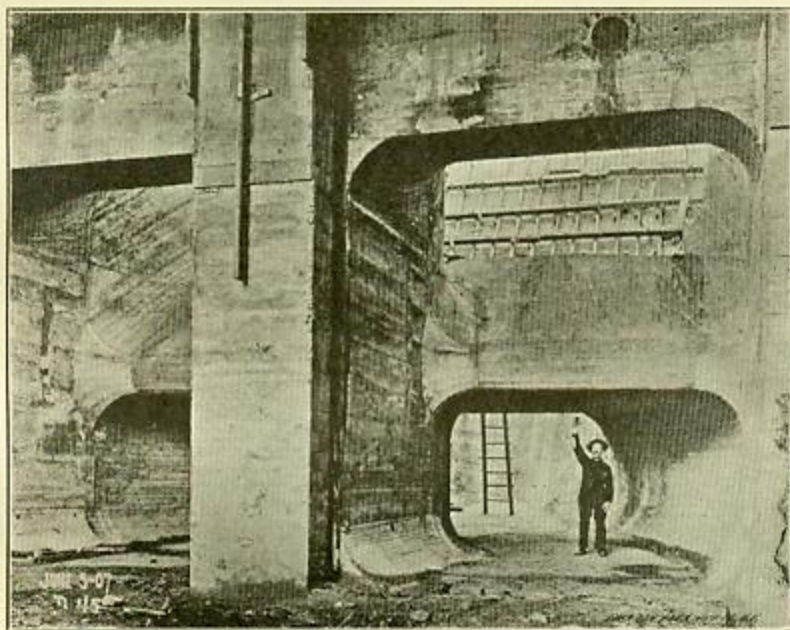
View of Concrete Draft Tubes looking toward Turbine, McCall Ferry Power Co.
